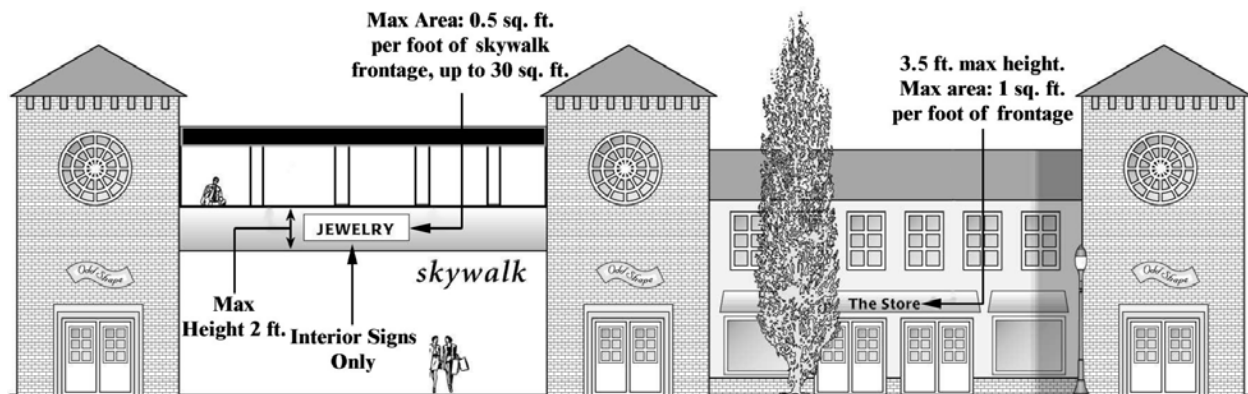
B Wall Signs in DD Subdistricts
